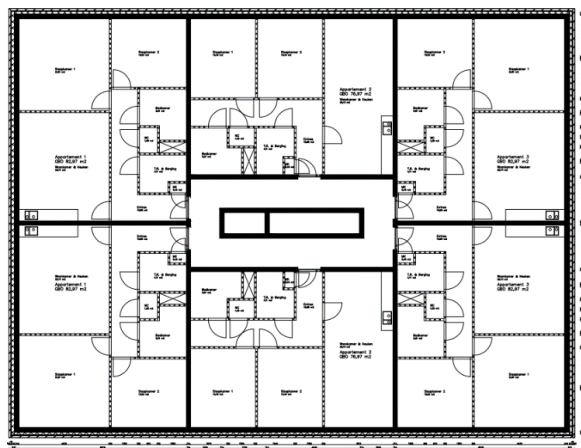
Floor plan Woongebouw M, floors 2-6. Corners: Apartment A; Middle: Apartment B (Klaver, 2018)
